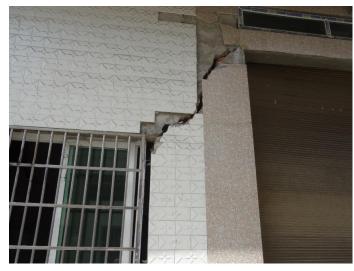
Cracks in the corners of brick concrete buildings in the disaster area
